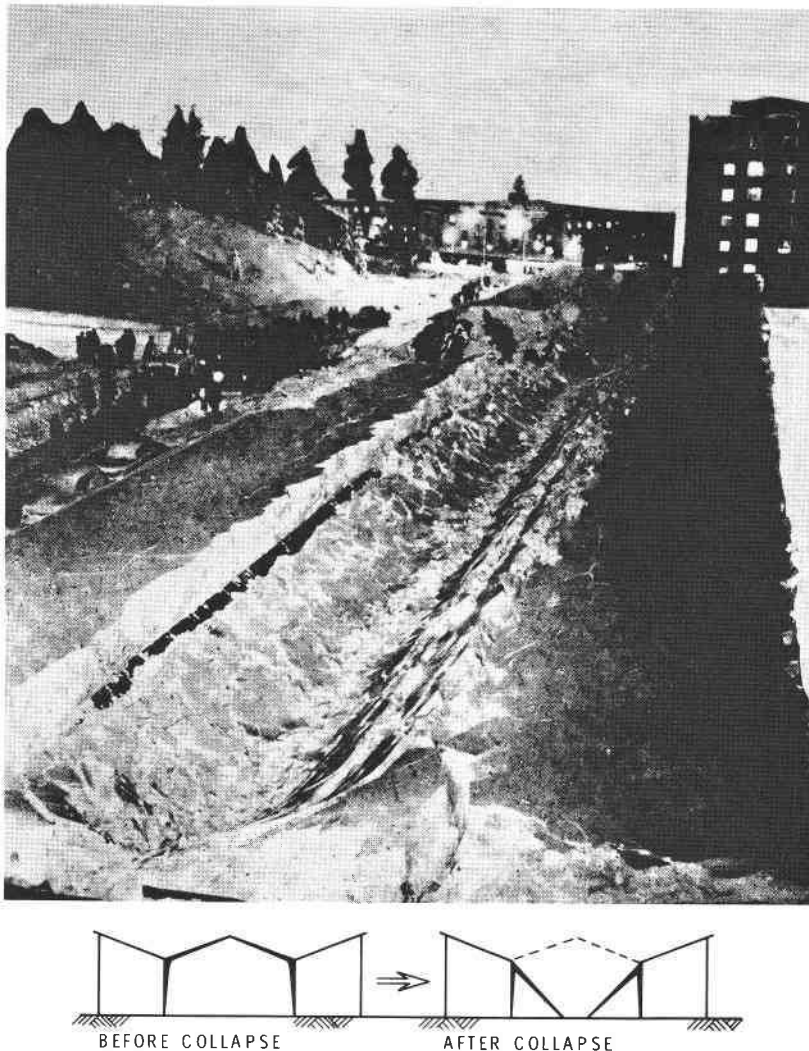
Progressive collapse of garage roof. Heavy snow loads caused one frame to collapse and with the subsequent overstressing and collapse of adjacent frames the failure progressed laterally until all 20 had collapsed. One person was killed (Granström and Carlsson 1974) (published with the permission of the authors).
